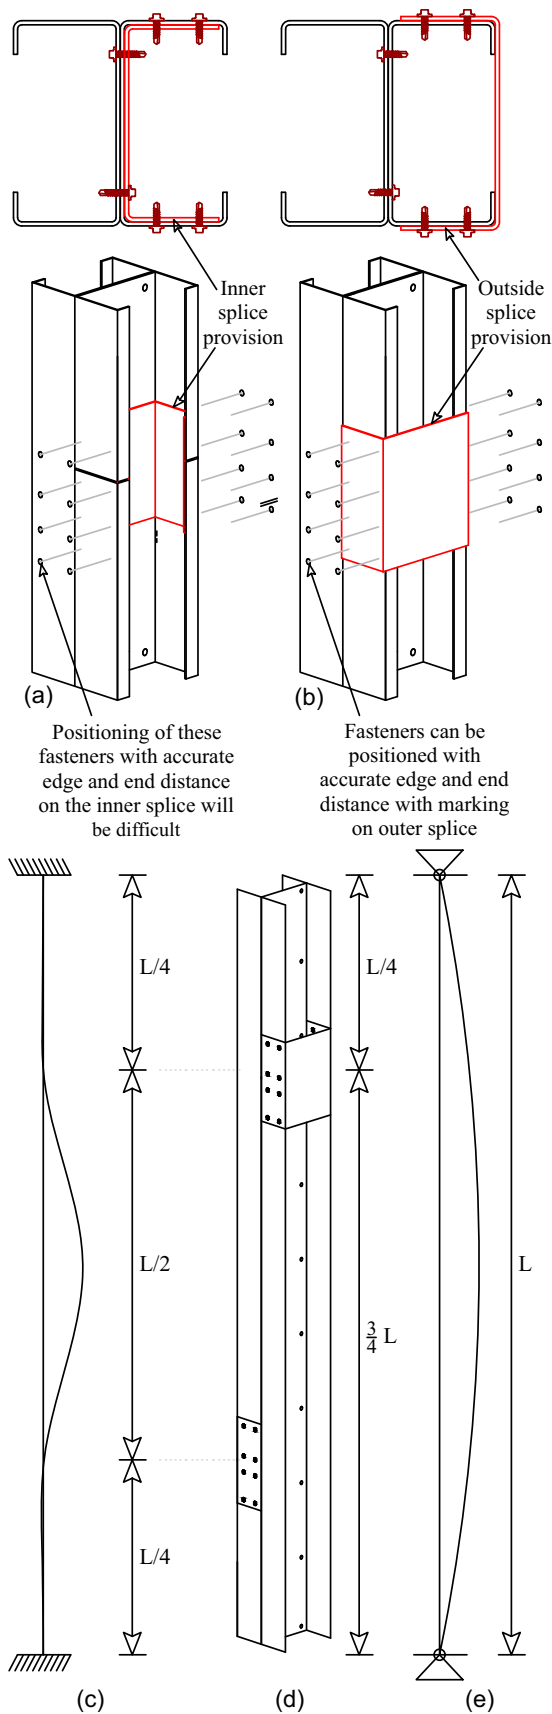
Possible splice connections in cold-formed steel construction: (a) column-to-column connection with inner splice; (b) column-to-column connection with outer splice; (c) fixed end column deflection shape; (d) appropriate location for the splices; and (e) hinged end column deflection shape.
